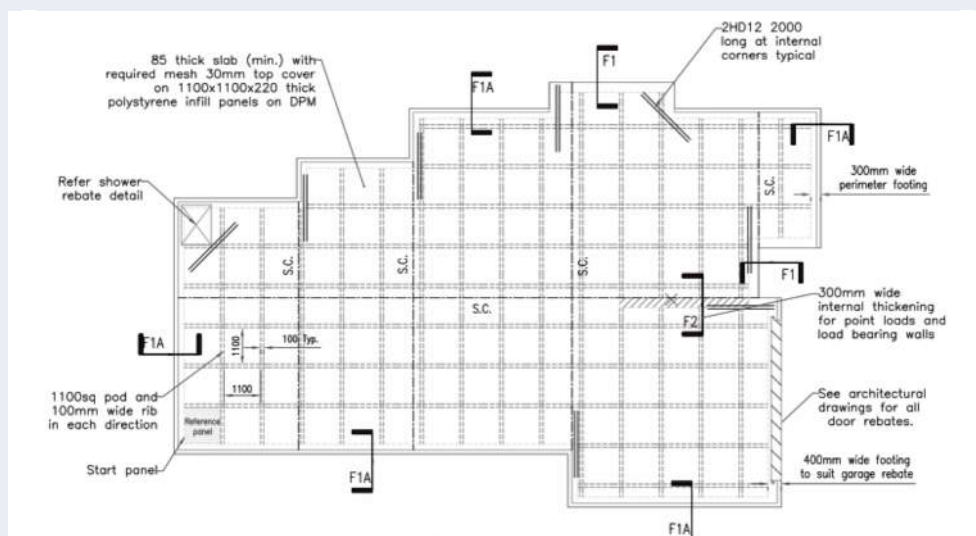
Allied Superslab layout (slab area = 197 m²)
